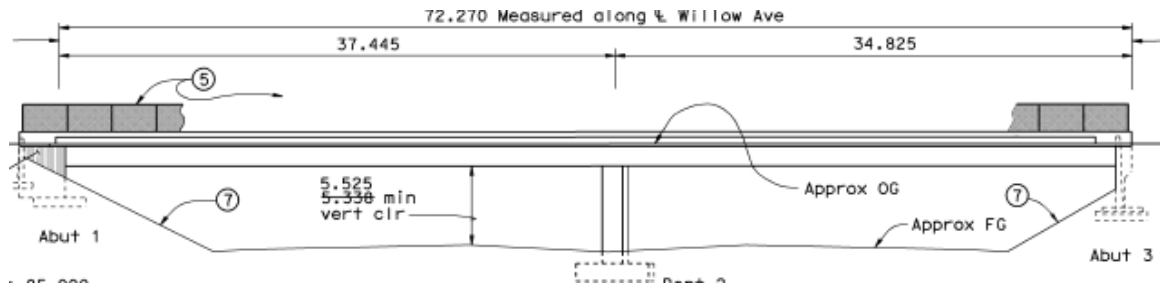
Elevation view of the Willow Avenue Overcrossing Bridge.
